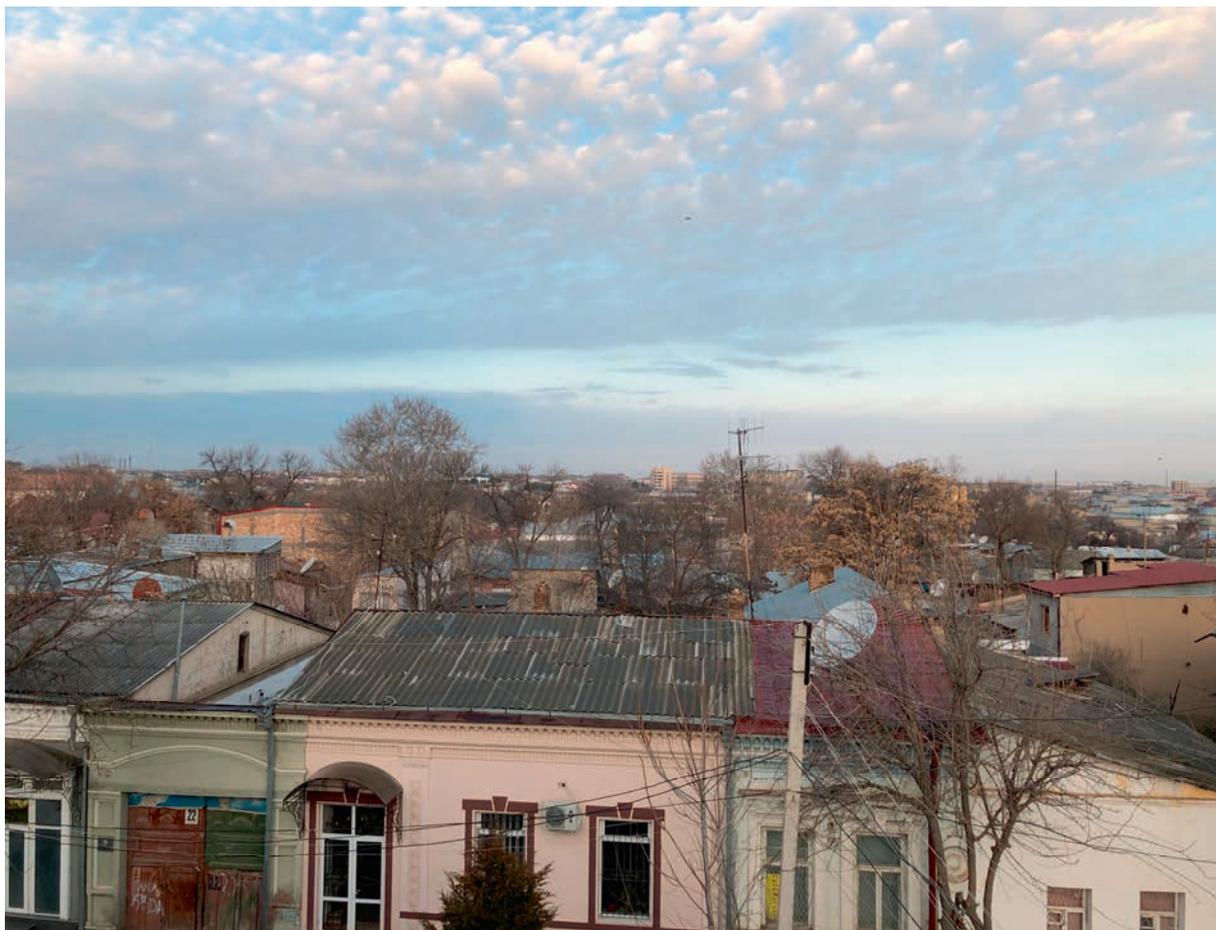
Roofing with corrugated asbestos sheets, Samarkand City
